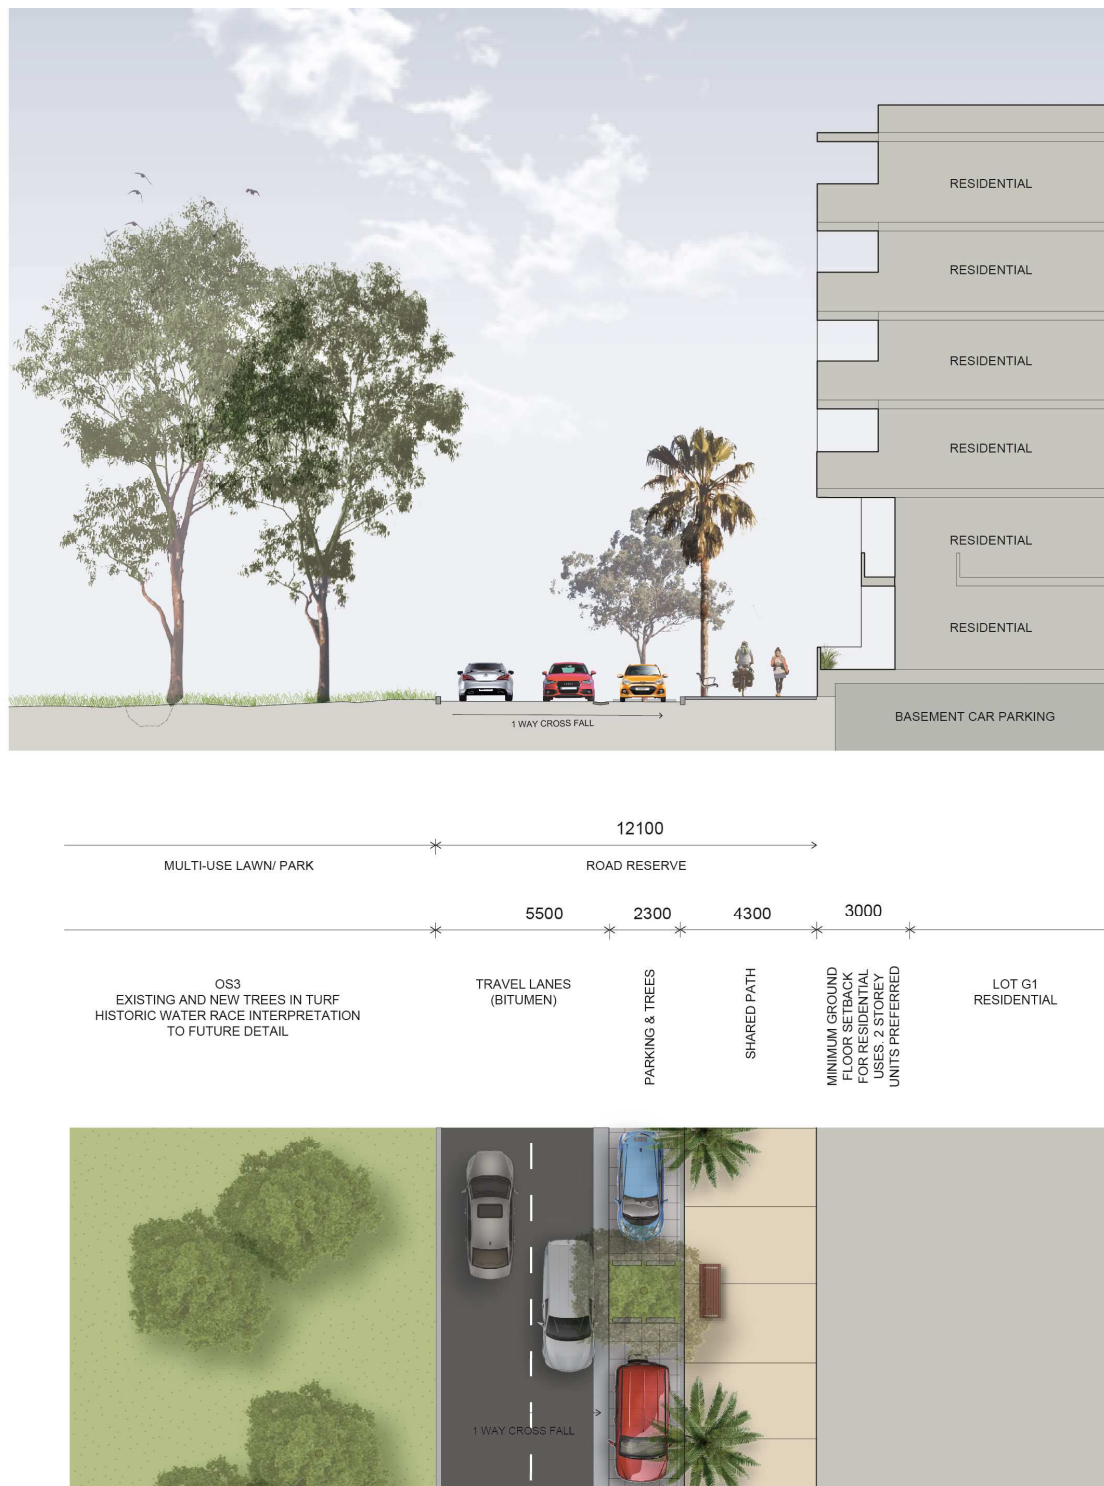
Typical street section 6 – East Circuit (east)
